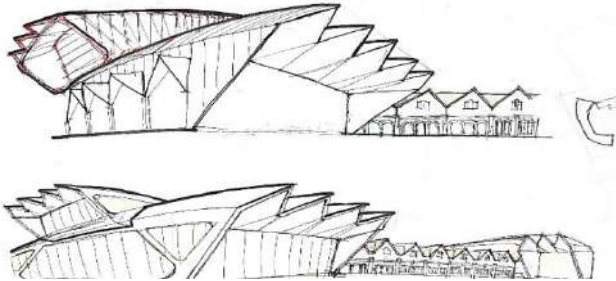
Conceptual sketches of integrating the heritage railway station building with the proposed extension: Source: Adapted from Kenya Railways Corporation, 2024.
